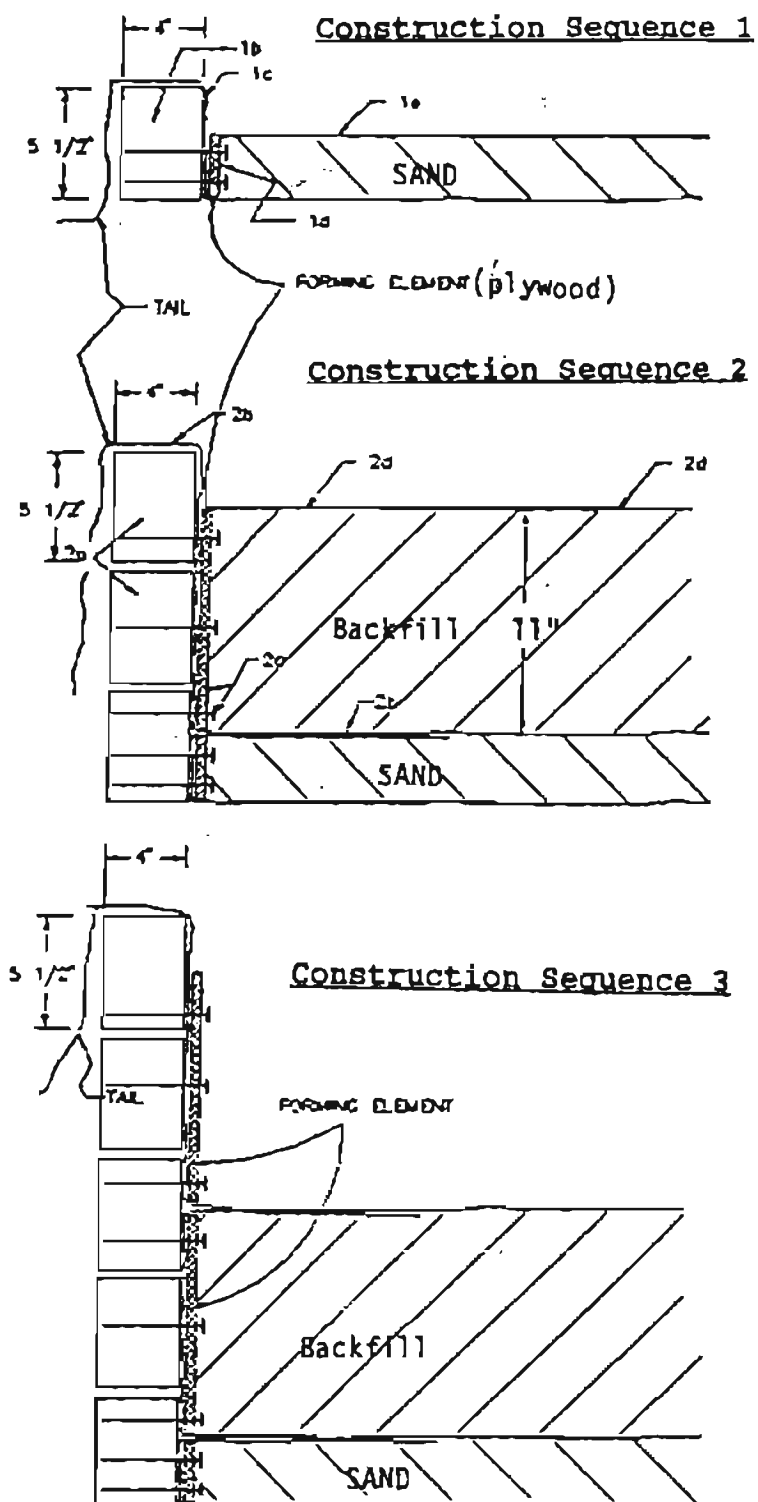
Construction Sequence of the Cohesive Backfill Test Wall
